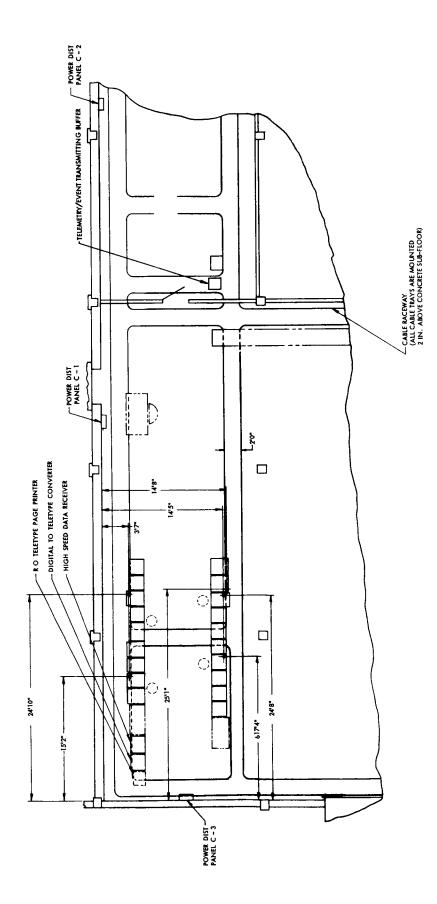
Cape Canaveral Tel-3 Building - Layout Diagram
